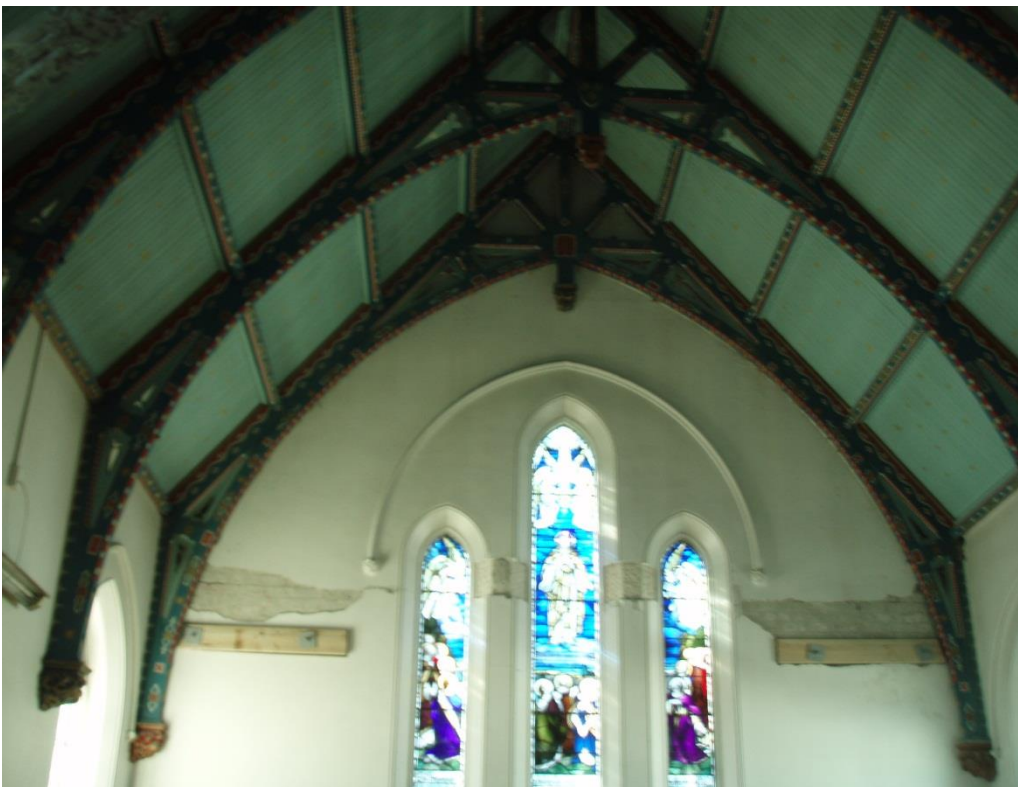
Interior view of east gable – note cracking at nave wall eave level
